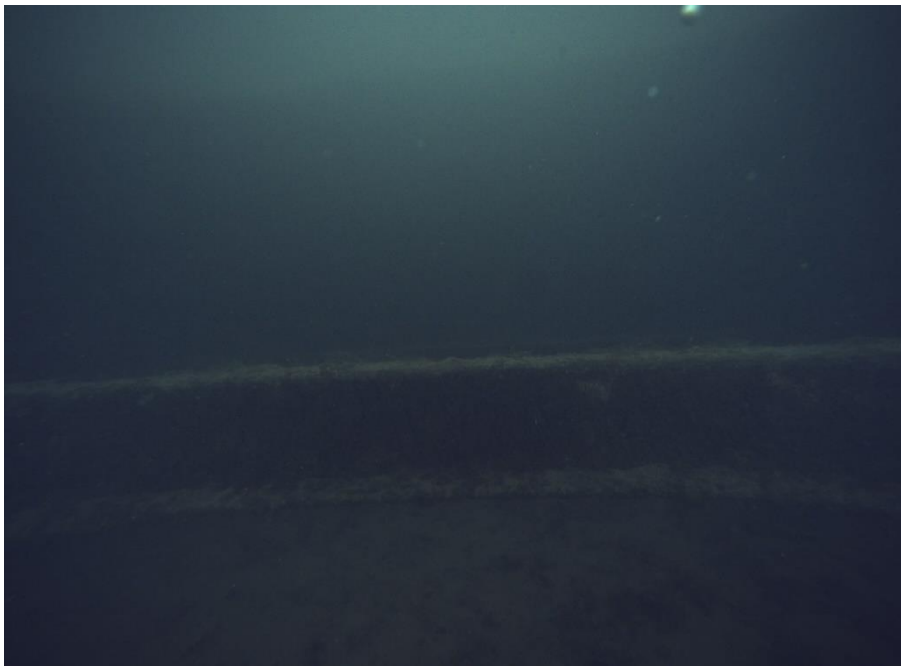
I-beam brace across the inlet headwall. The I-beam appears to be intact and covered in thick fouling.
